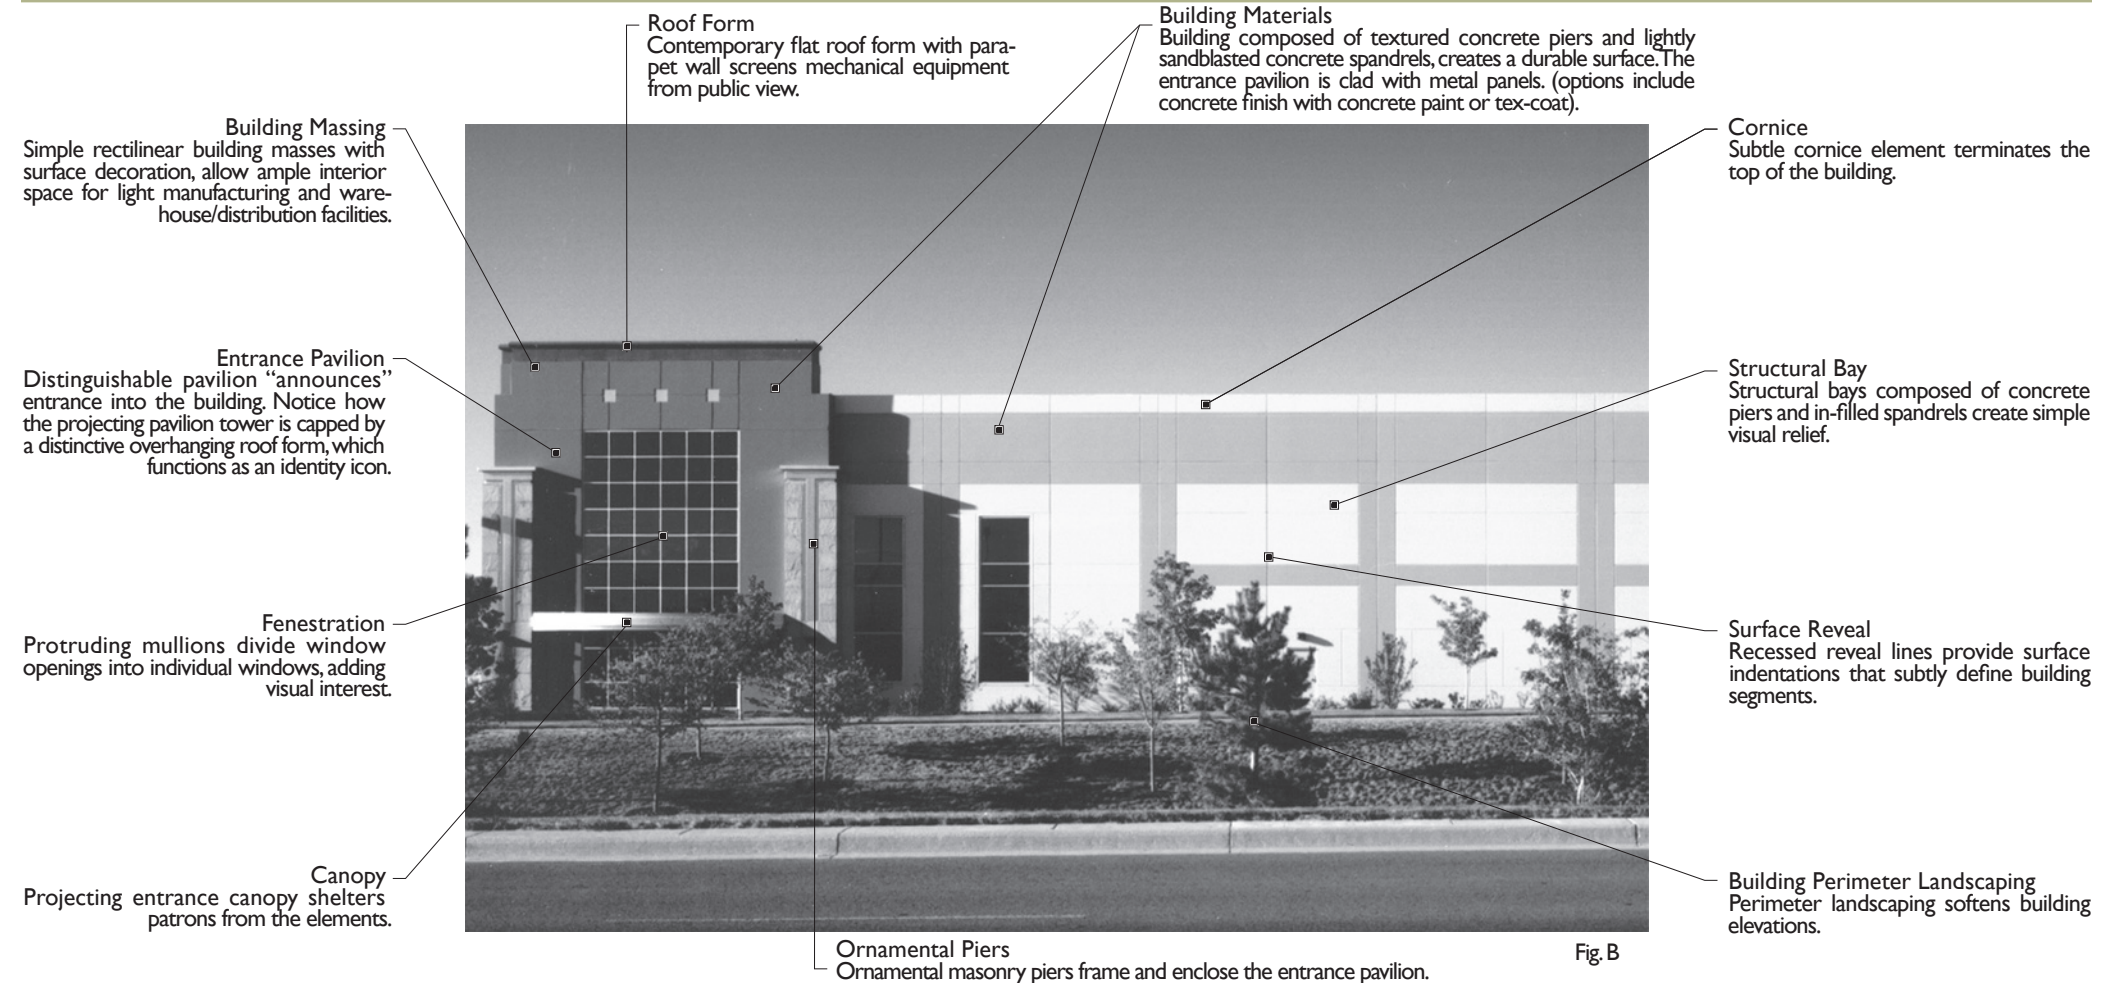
Segment building facades into a series of individual structural bays composed of piers, spandrels, and window openings.
